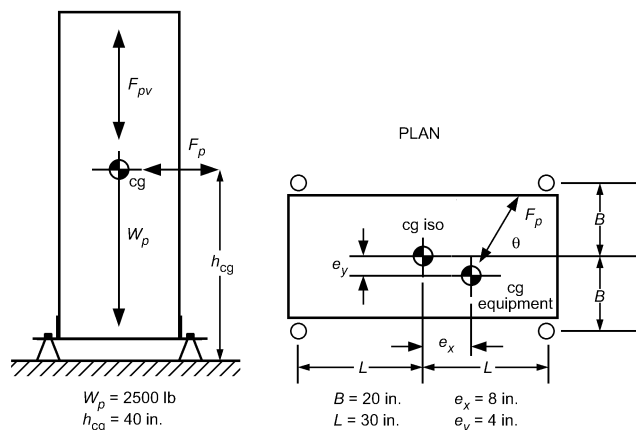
Equipment with Center of Gravity Different from Isolator Group (in Plan View)
